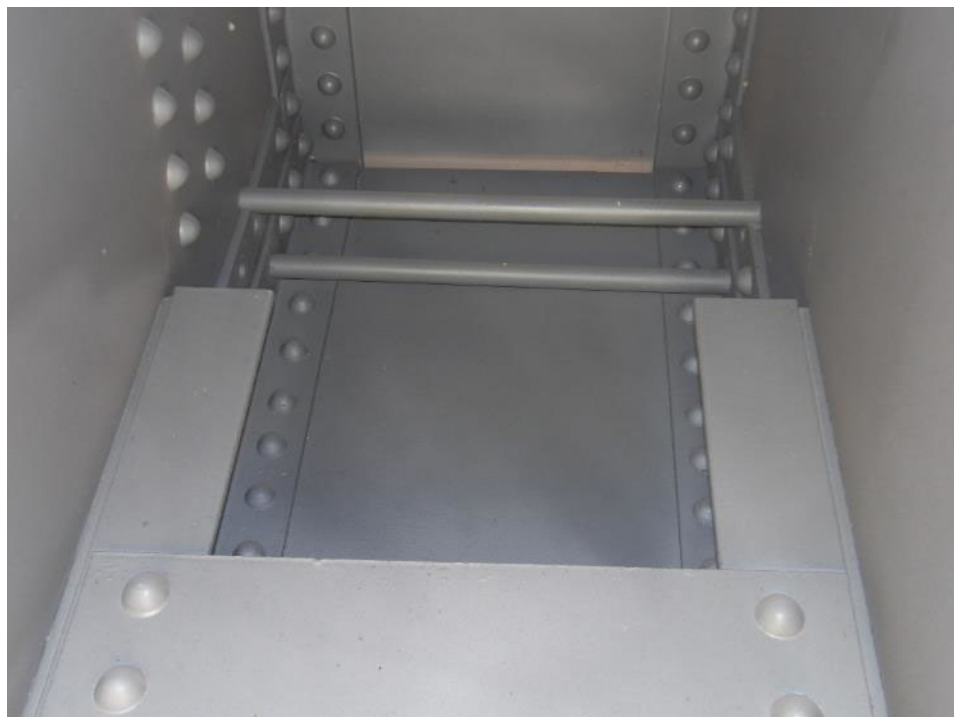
Typical view of interior of spandrel girder at outrigger through bolt connection in good condition.
